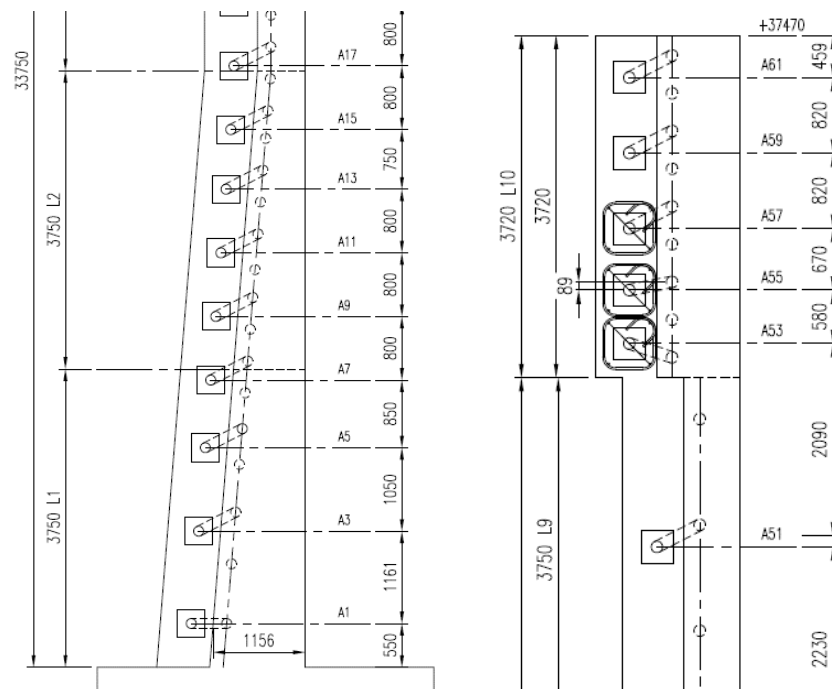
POST TENSION HORIZONTAL ARRANGEMENT
